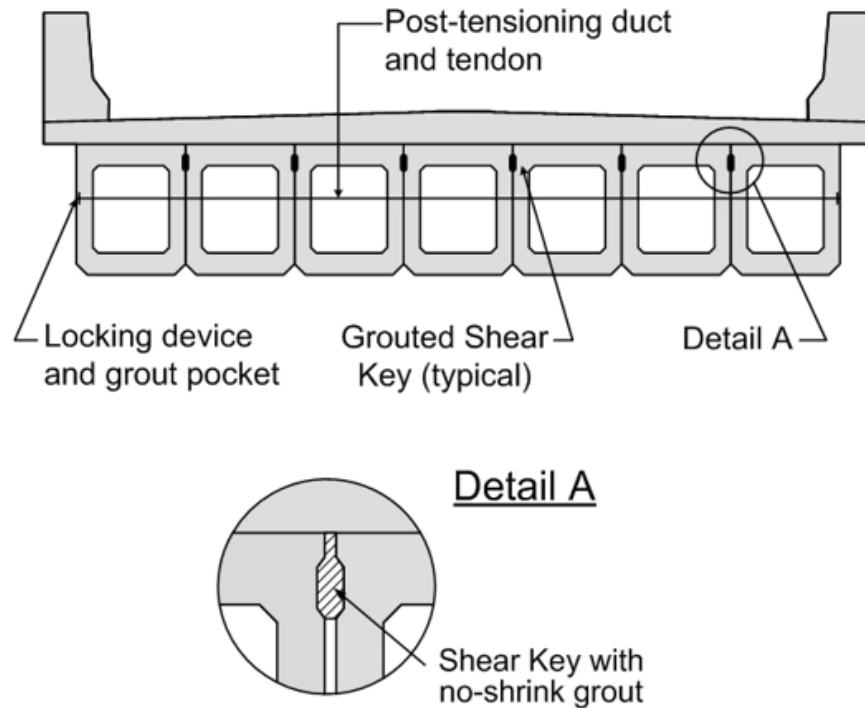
Transverse Post-Tensioning and Shear Keys for Adjacent Box Beams
